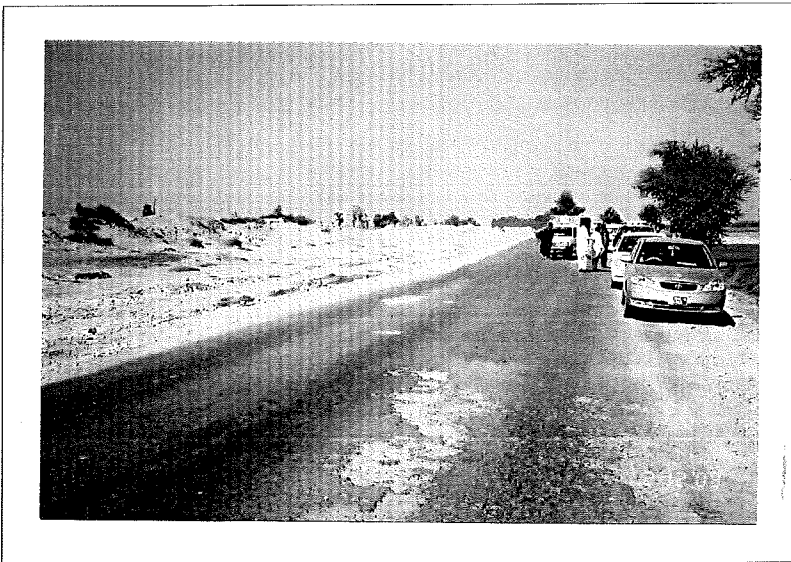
No sign of TST layer. Poor drainage conditions are also visible.
